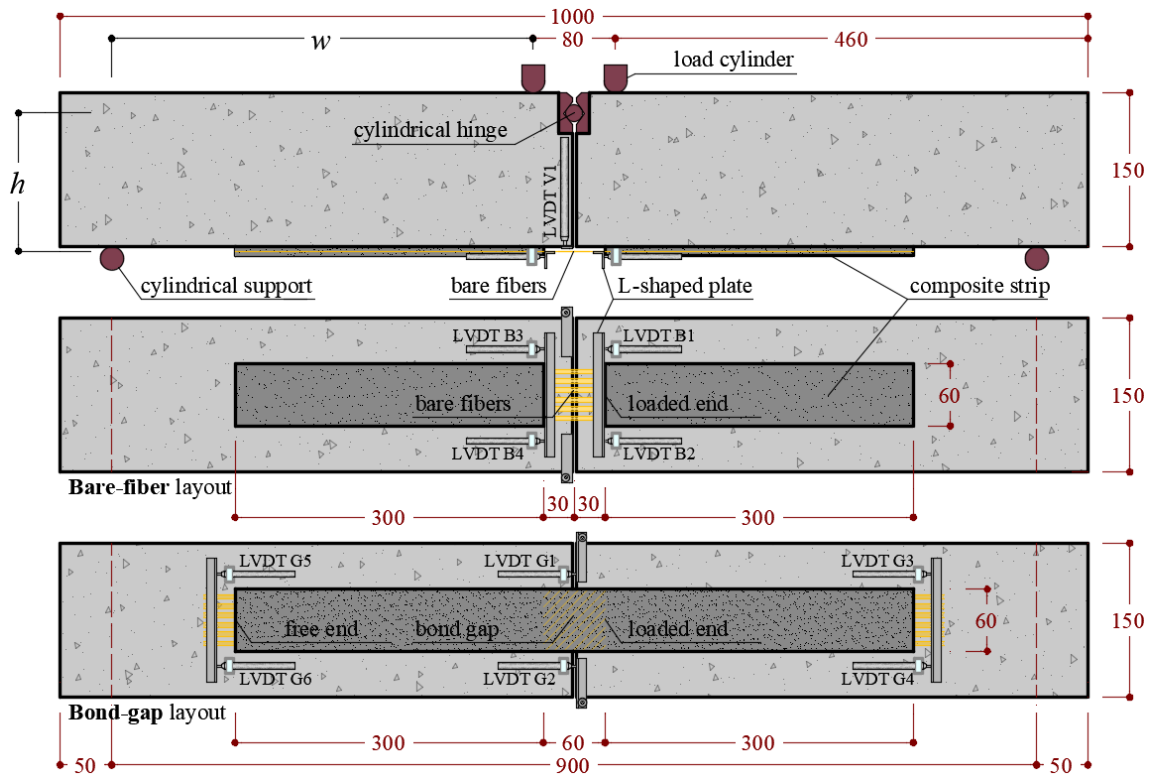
Geometry of bare-fiber and bond-gap layout modified beam tests (dimensions in mm).
